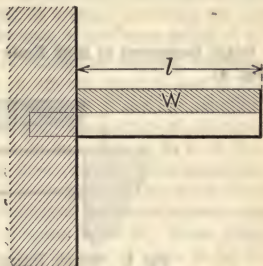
Cantilever Beam. Distributed Load over Entire Span
